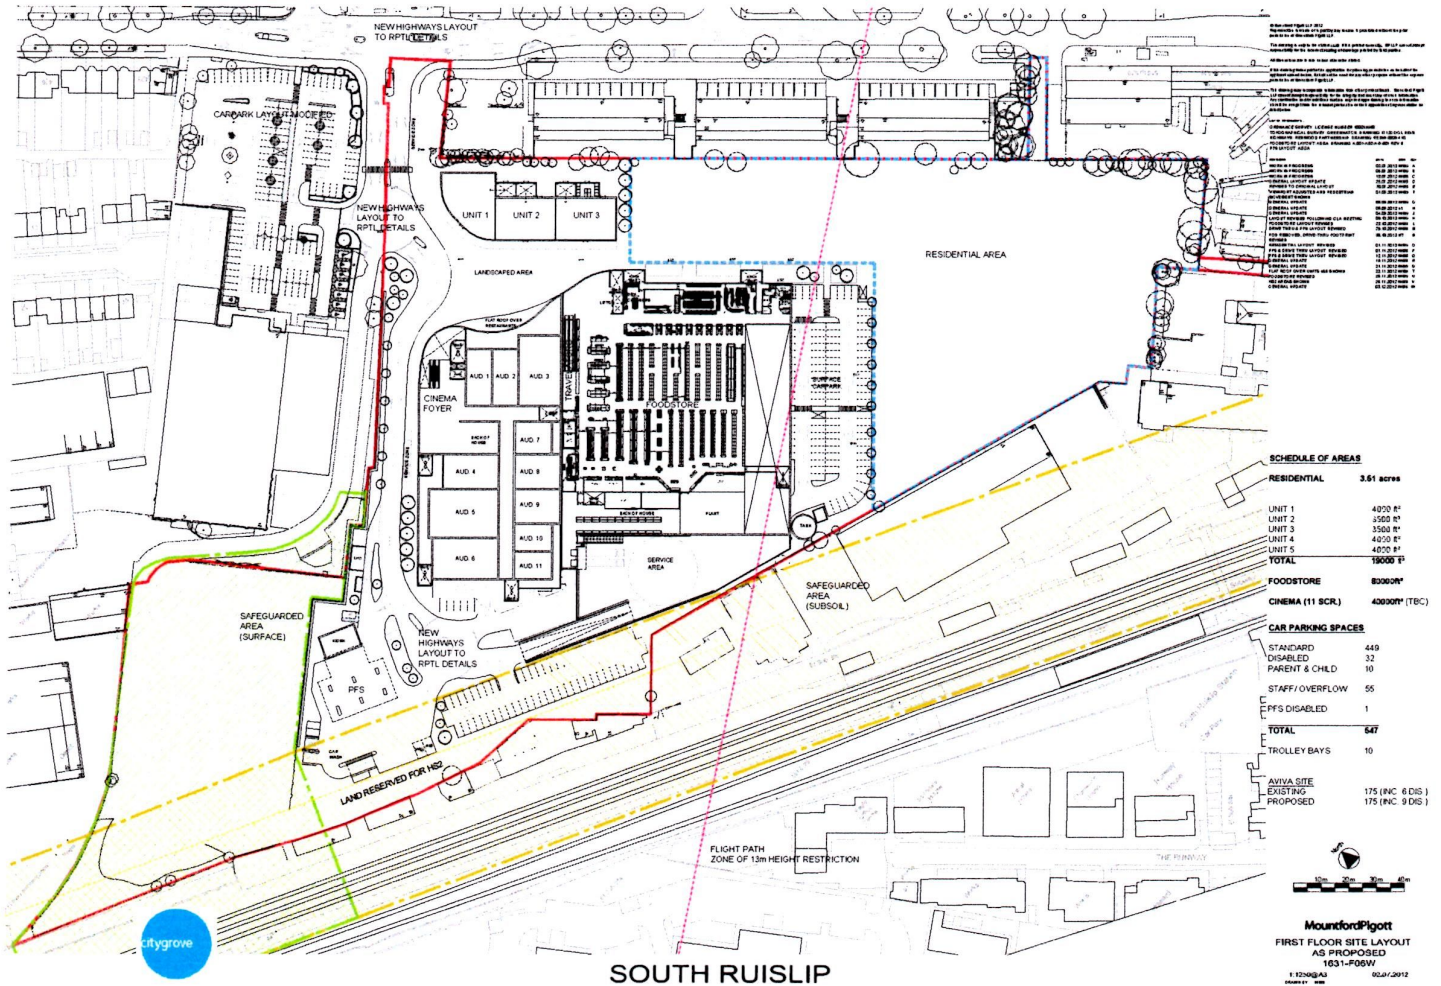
PROPOSED DEVELOPMENT FIRST FLOOR
